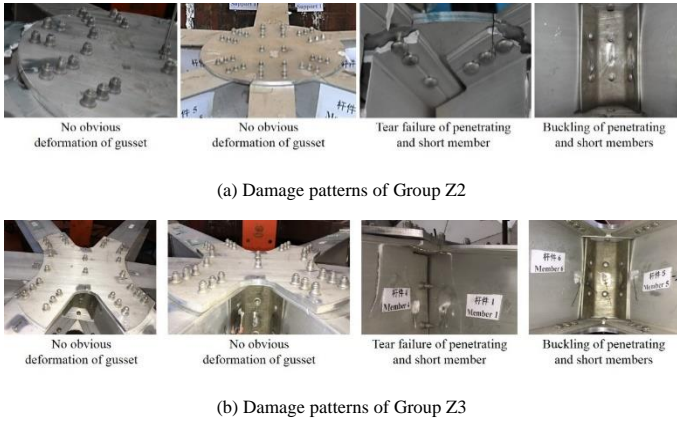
Damage patterns of specimens with different gusset shapes
